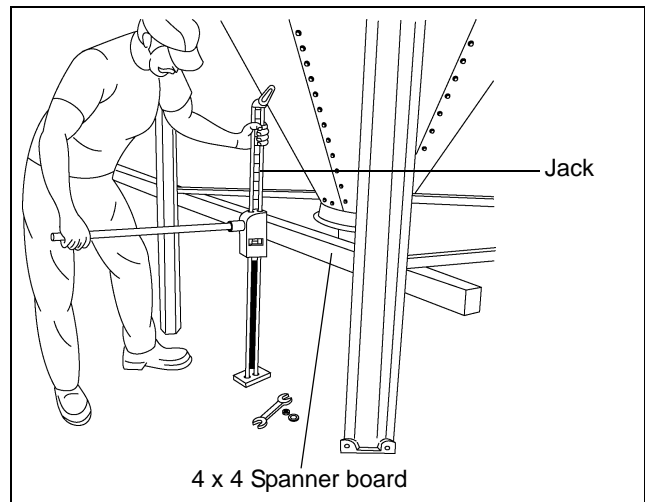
C All bolts, nuts and washers removed from anchor base plate.
